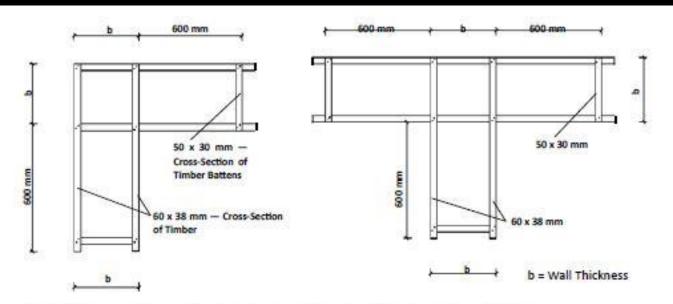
Stitches made from wood dowels at wall corners and intersections (adapted from: Bothara et al. 2002)
